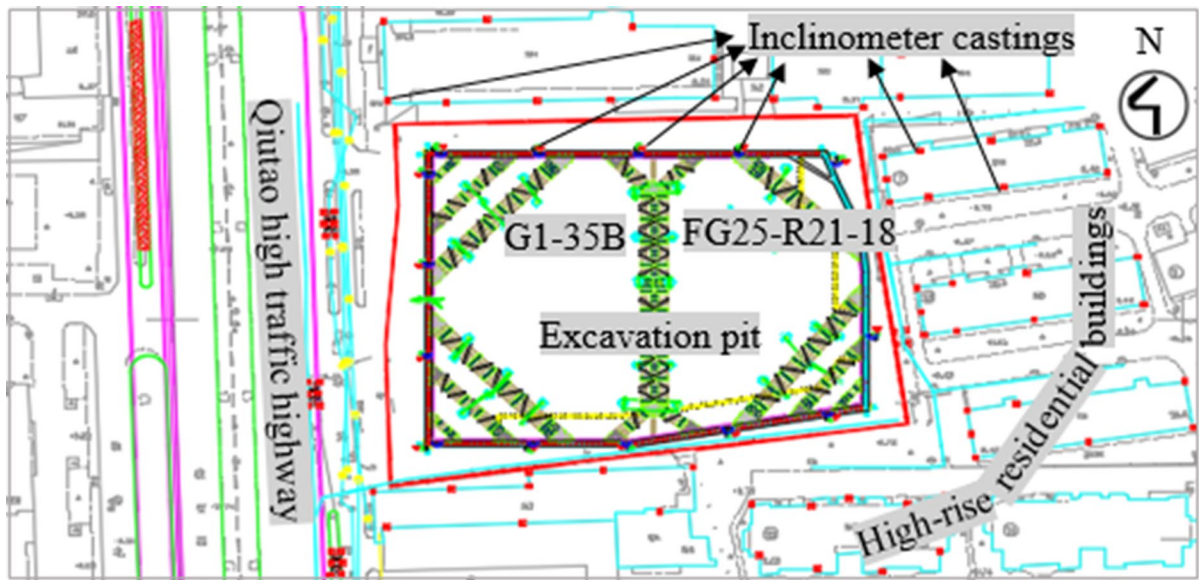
Triumph Unit project plan view showing the excavation pit, surrounding environment, and the inclinometer points for monitoring purpose
